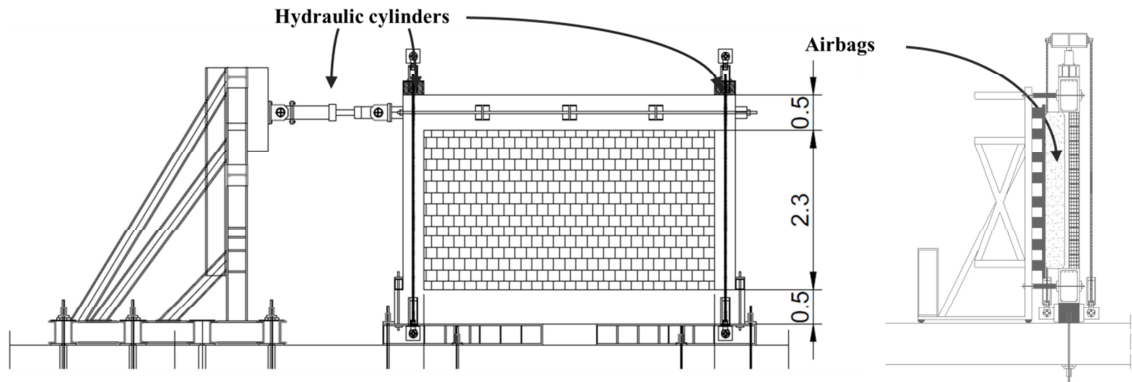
Masonry wall dimensions and actuators setup for the in-plane test (front-view: (a)) and out-of-plane test (lateral-view: (b)).
